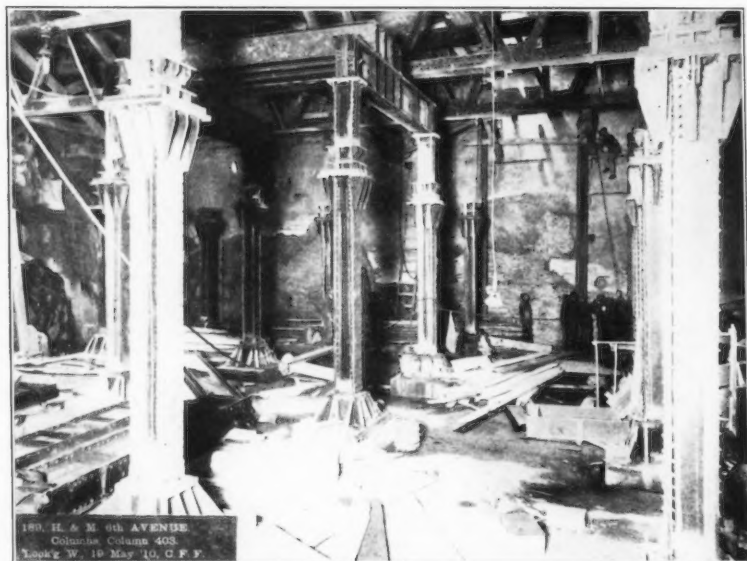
COLUMNS, WITH GRILLAGES, FOR SUPPORTING COLUMNS OF ELEVATED RAILROAD.
